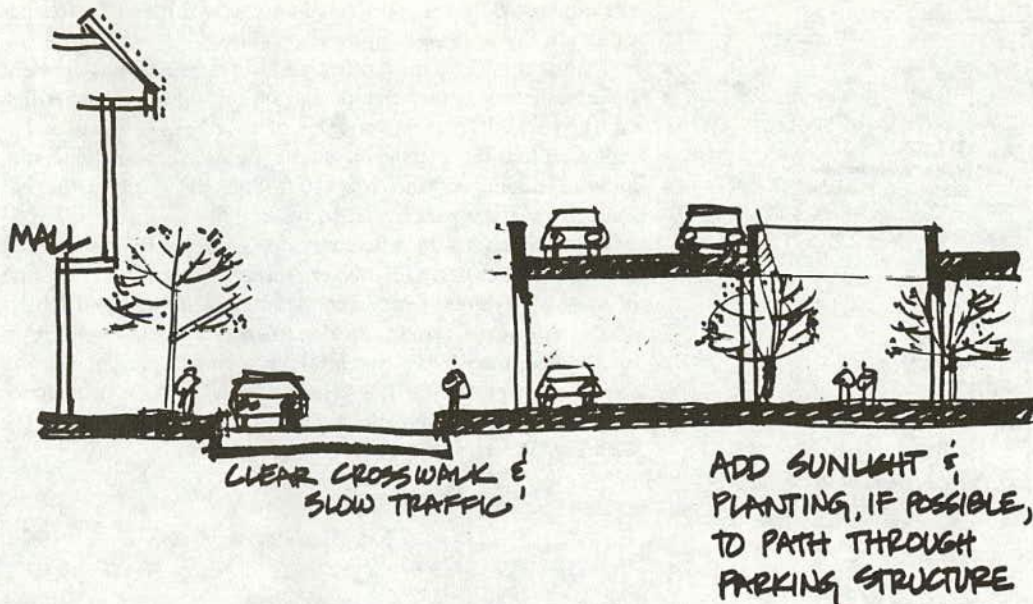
Design concepts for adding sunlight and plantings within structured parking.
